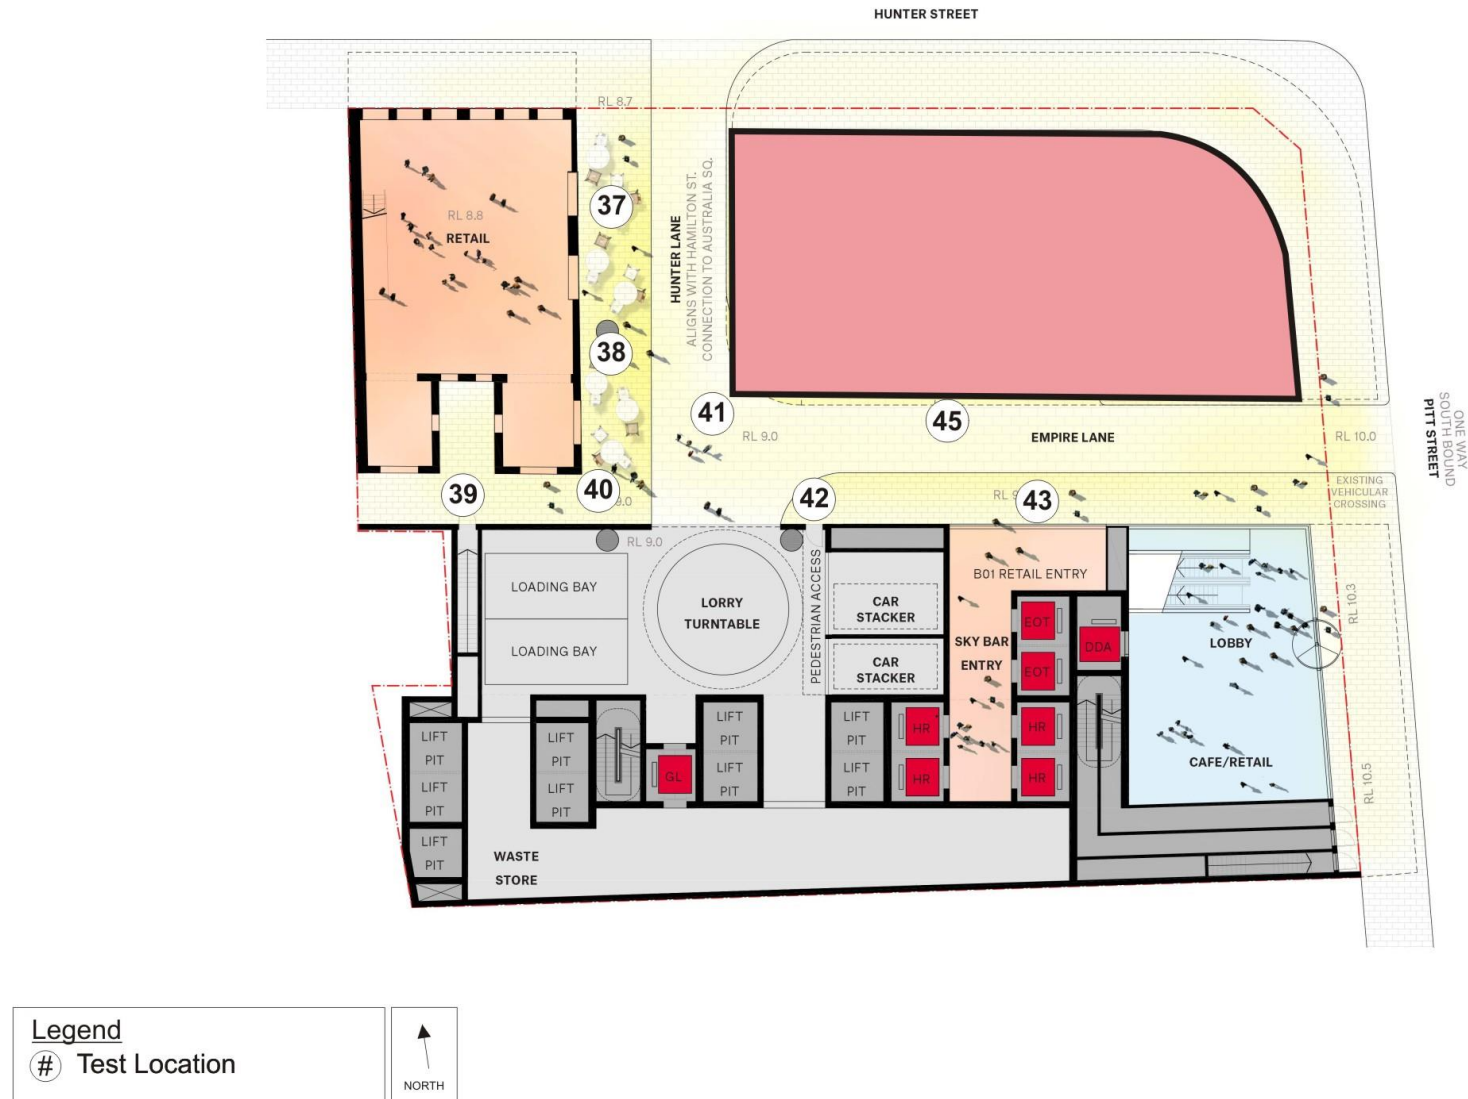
Ground level Test Locations around the internal Laneway of 15-23 Hunter Street and 105-107 Pitt Street Development, Sydney.
